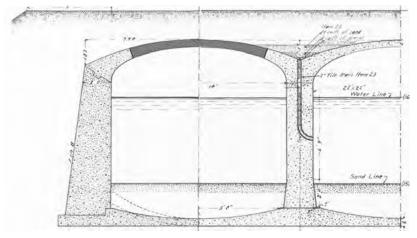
A : COLLAPSE MECHANISM: INITIAL CRACKING
